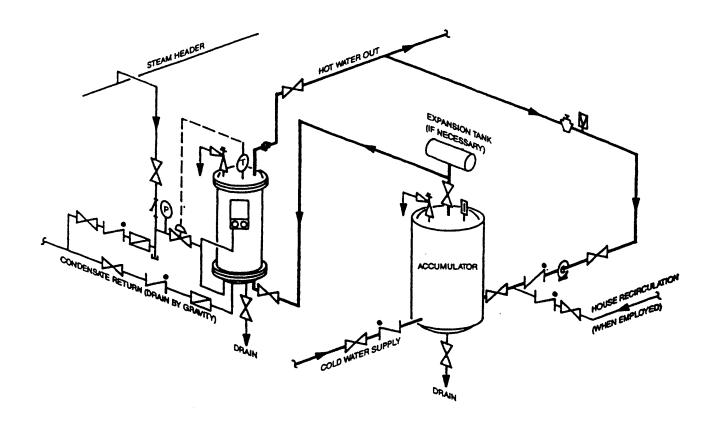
Piping Connections for a Single Heater used with an Accumulator
